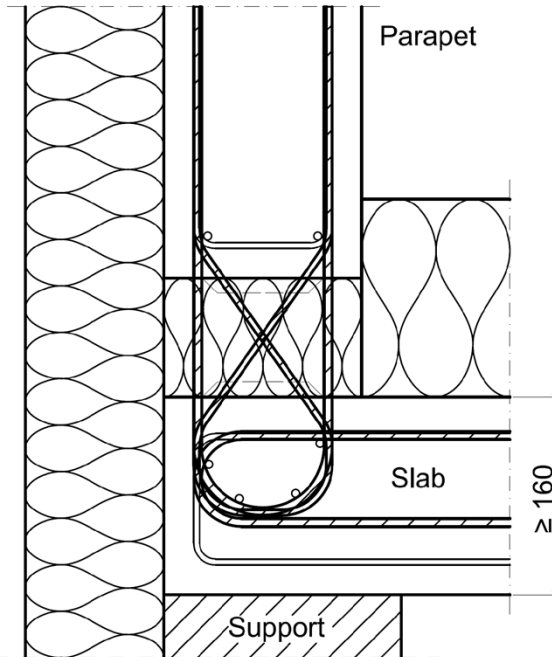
Example of Schöck Isokorb® Type A with SCE with on-site reinforcement
